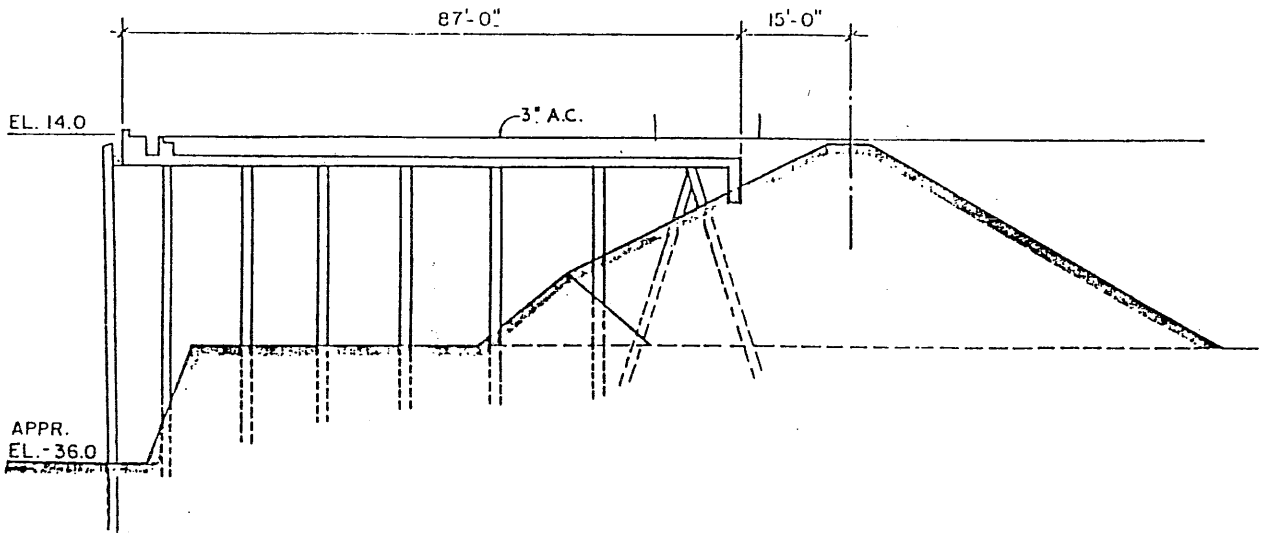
Typical Section for Trestle Pier. (From Benuska, 1990.)
